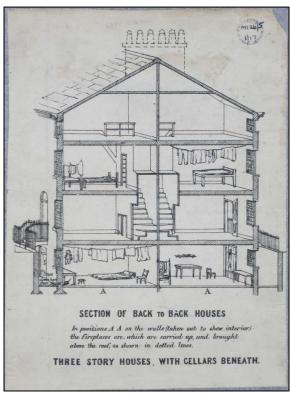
Cross section of back-to-back houses. Manchester Local Image Collection M126/5.
